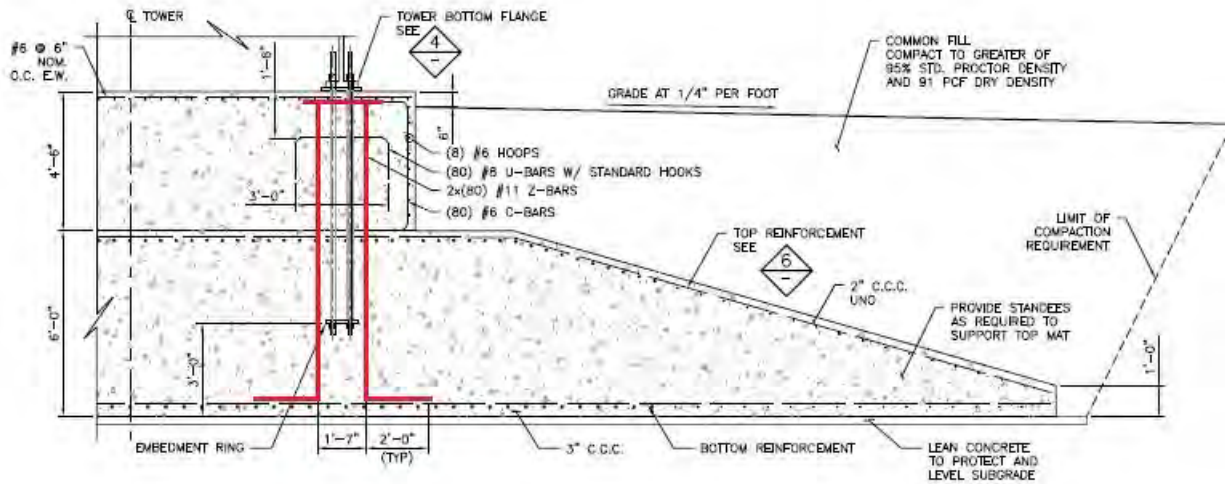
Post-2010 Foundation design example with additional vertical reinforcement.
